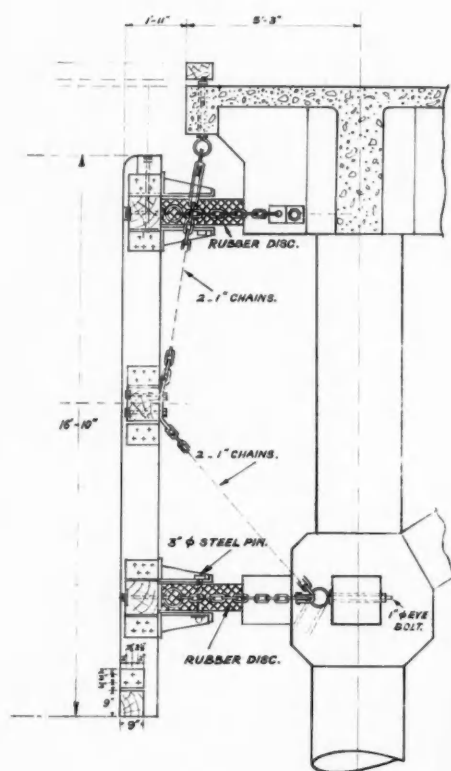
Sectional elevation of fender system at Port Swettenham.
